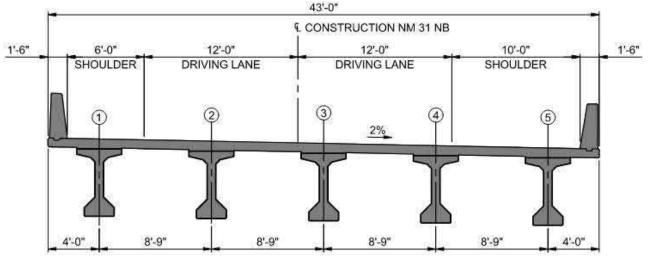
NM 31 Proposed Pecos River Bridge Typical Section
